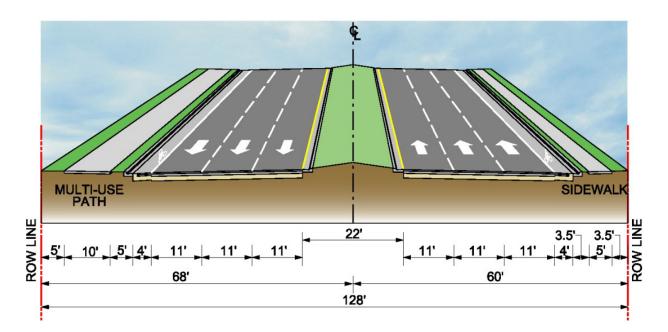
SIX-LANE DIVIDED URBAN TYPICAL SECTION PROMENADE TOWN CENTER TO FORT KING ROAD
